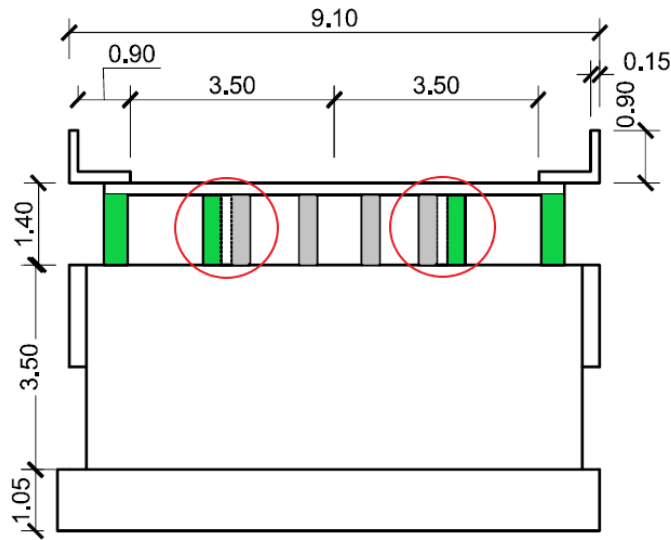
Cross-section of the bridge; Grey: Original beams; Green: Widened beams
